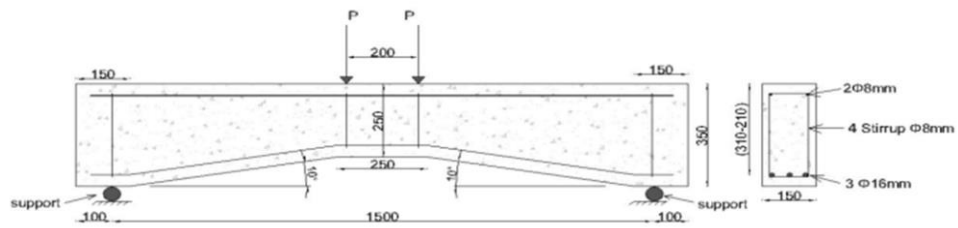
Geometries and steel reinforcement details of RCHBs type A
